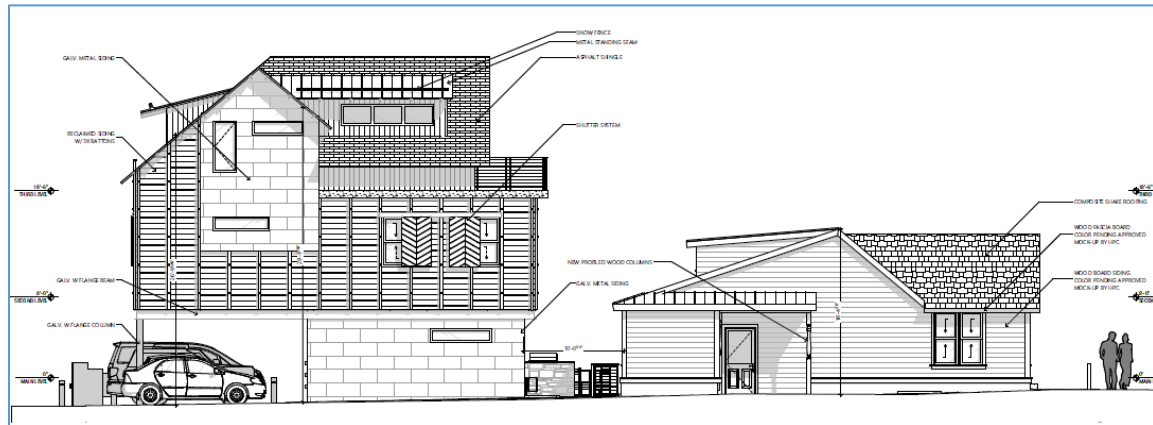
West Elevation revised, January 27, 2021. Height of alley building is reduced, the third floor mass is reduced and setback from the south, east, and north elevations.
